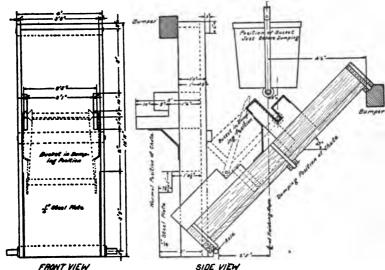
Dumping Chute for One-Ton Sinking Bucket. Designed by Lucien Eaton.
